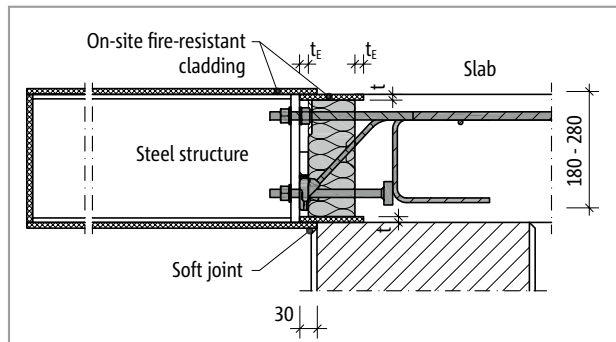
Schöck Isokorb® T type SK: On-site fire-resistant cladding for Isokorb® and steel structure; cross-section
